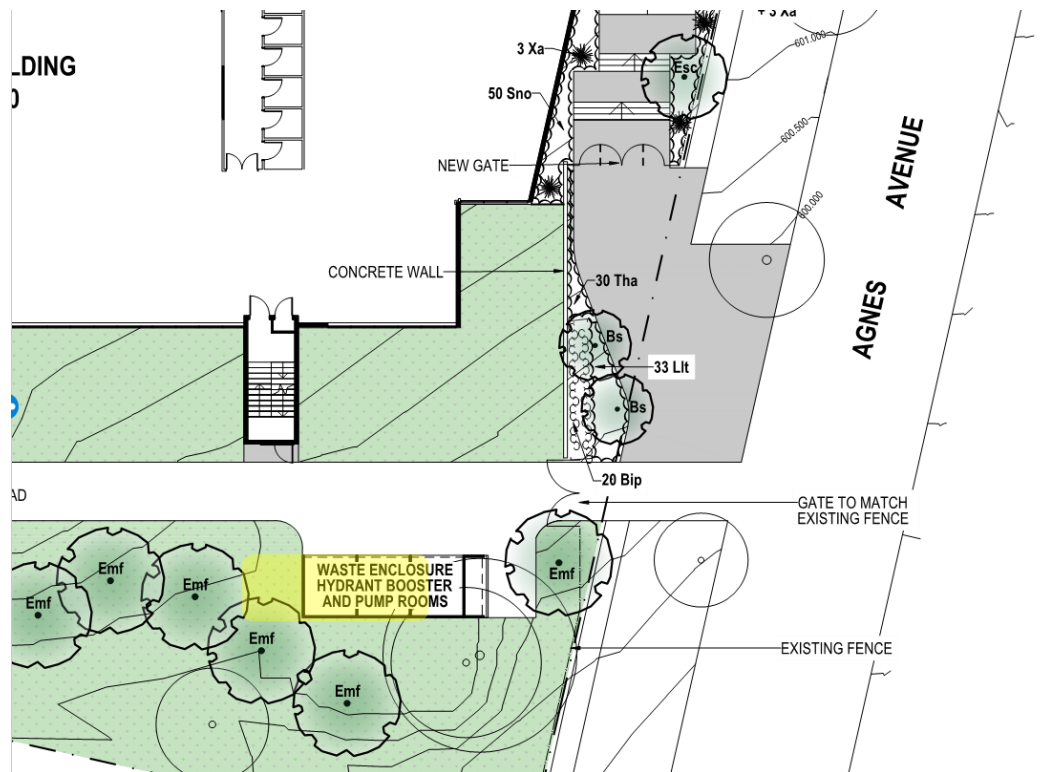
location of proposed waste area. The proposed location does not appear to permit a waste collection vehicle to enter and exit the site in a forwards direction.
